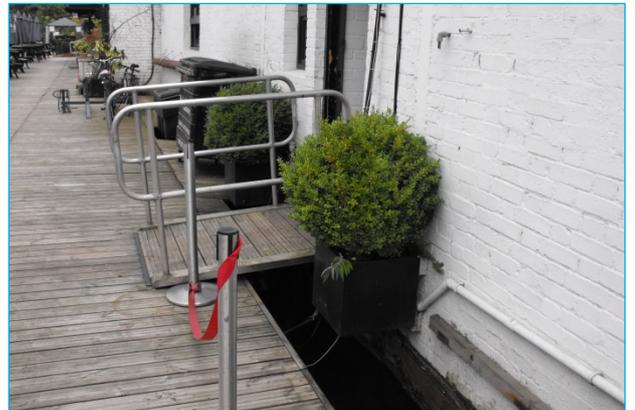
Planters attached to the northern elevation of the building complex overhanging canal.
